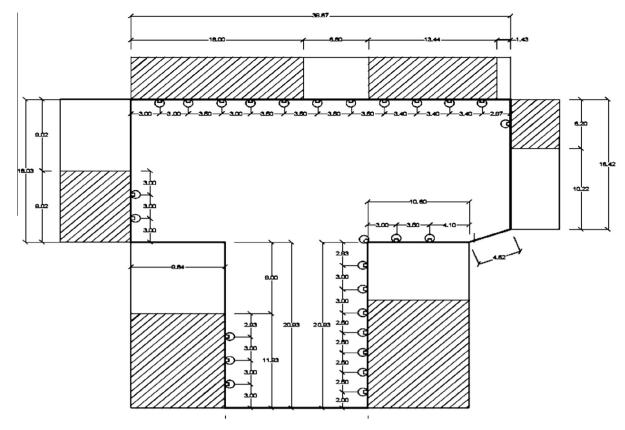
Plan of excavation and the position of the steel column supporting system.
